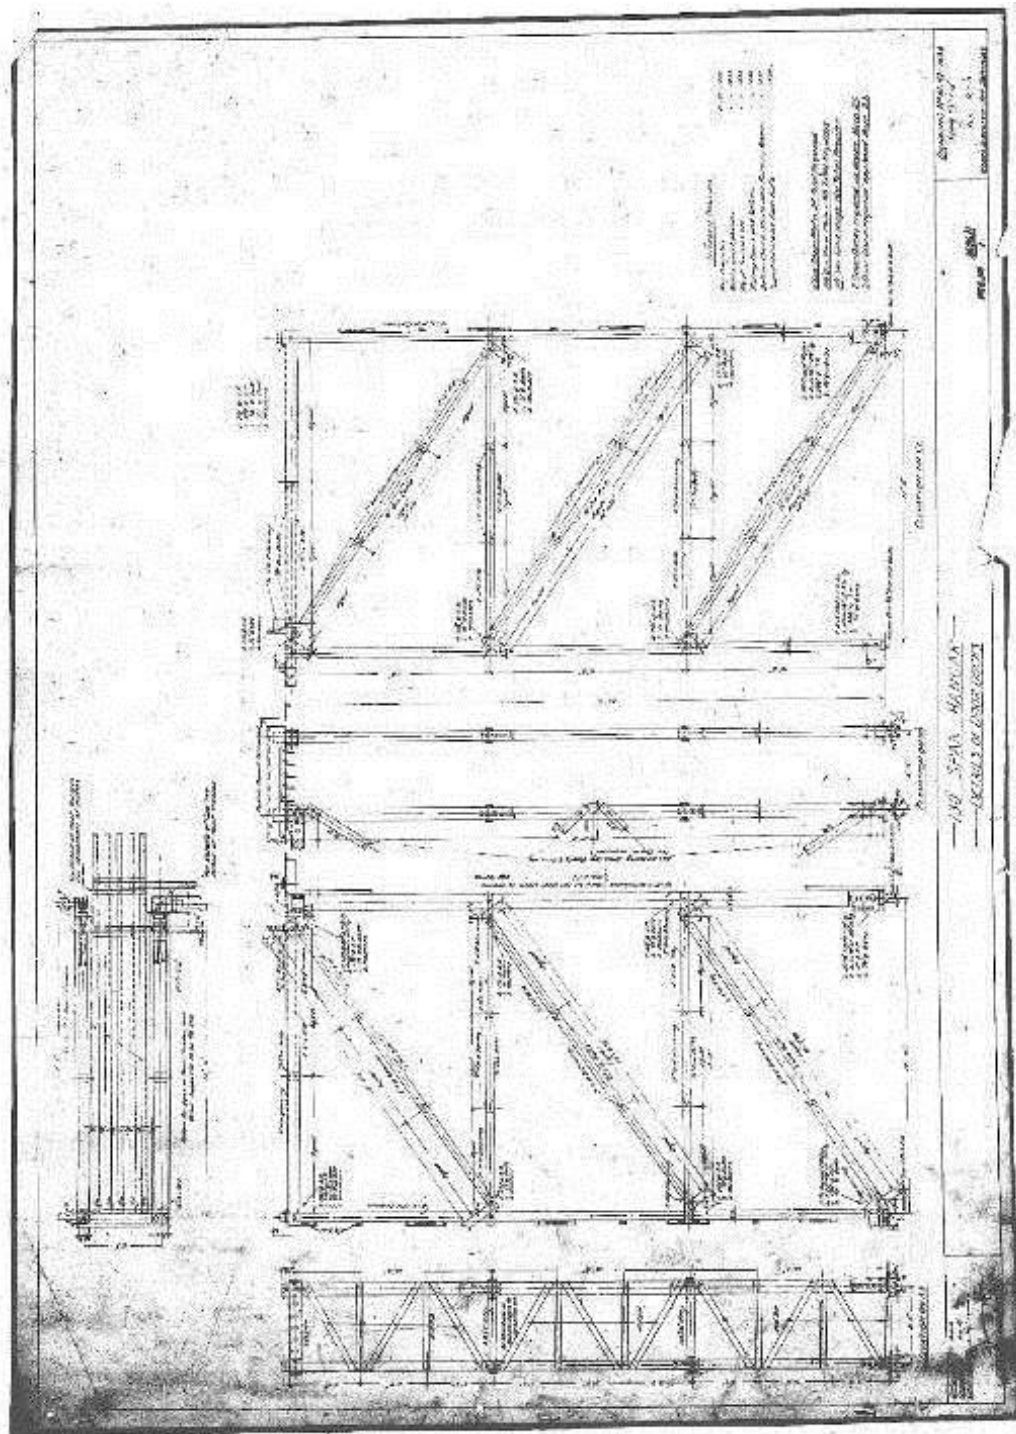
Detailed Drawing of the Door Docks for Hangar 1
